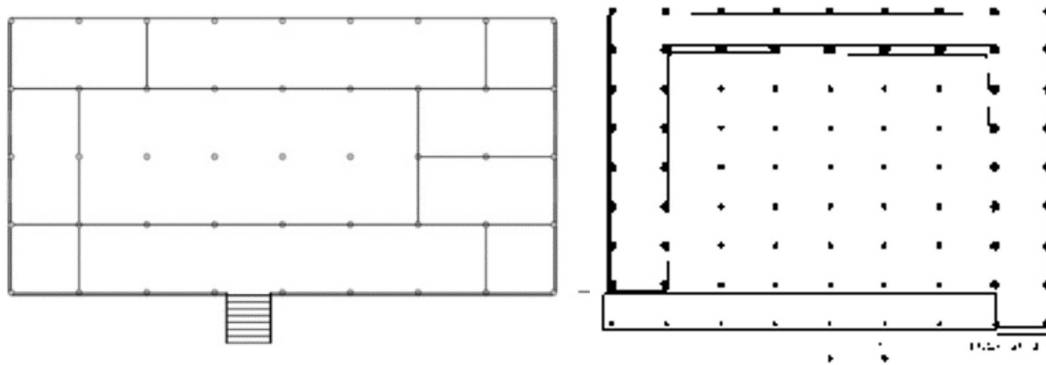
The Floorplan of Bagas Godang in Panyabungan Tonga (left) and Singengu Jae (right) (Source: Khamdevi 2017-2020)
